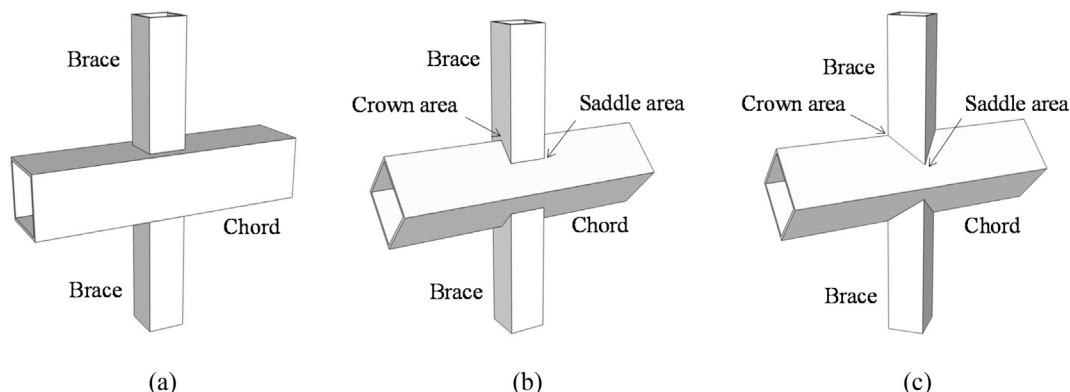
Welded SHS X-joints: (a) conventional; (b) square bird-beak; (c) diamond bird-beak.
